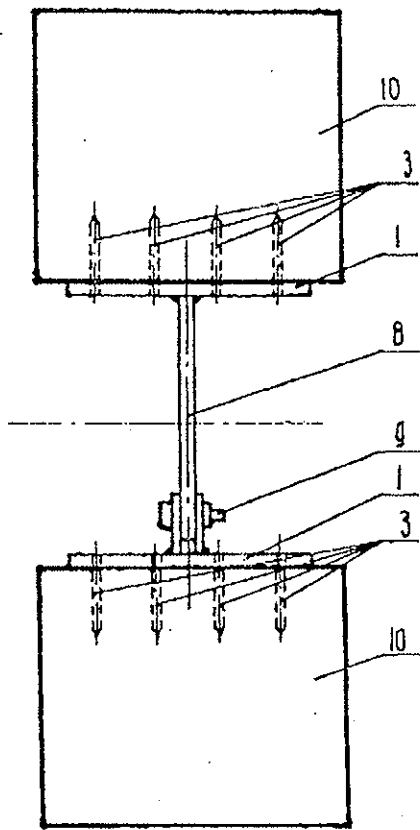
Connector for spacing upper and lower chords of built-up timber beam.
